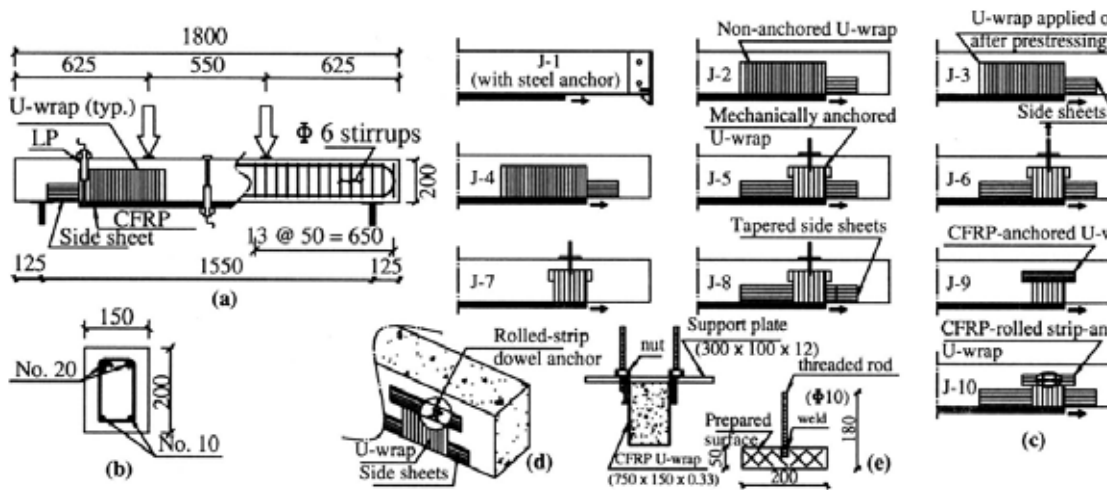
Beam details: (a) test setup; (b) cross section; (c) various anchors; (d) dowel anchor (J-10); and (e) mechanical anchorage for U-wraps (Kim et al. 2008a,b).
